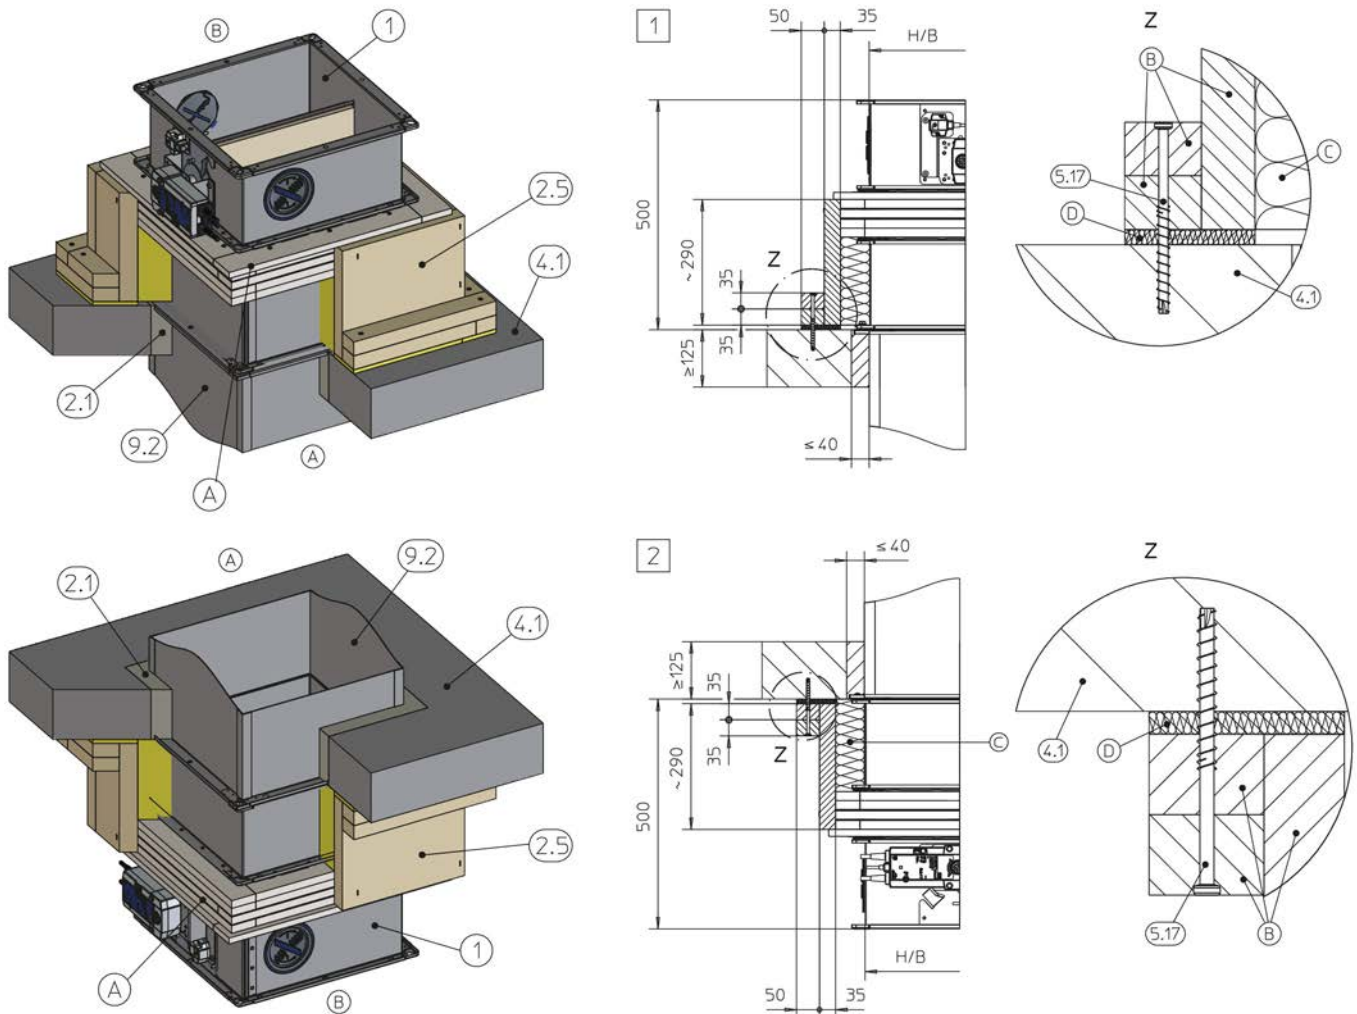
Mortar-based installation into a solid ceiling slab with solid wood ceiling, upright (illustration is an example; installation into other types of solid wood ceiling systems may be possible depending on local conditions)
